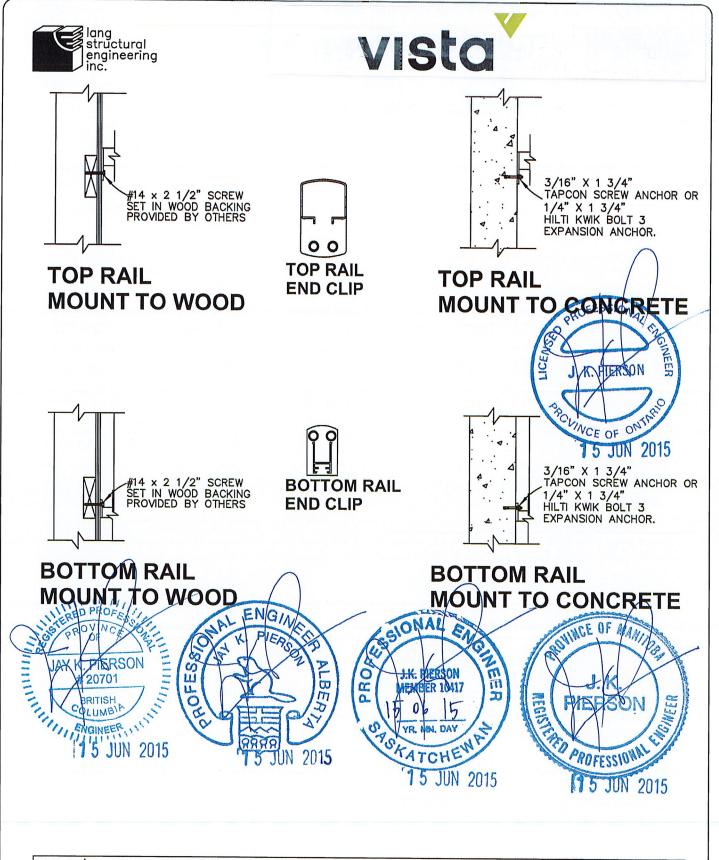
ACCEPTABLE GUARDRAIL MOUNTING CONFIGURATIONS
